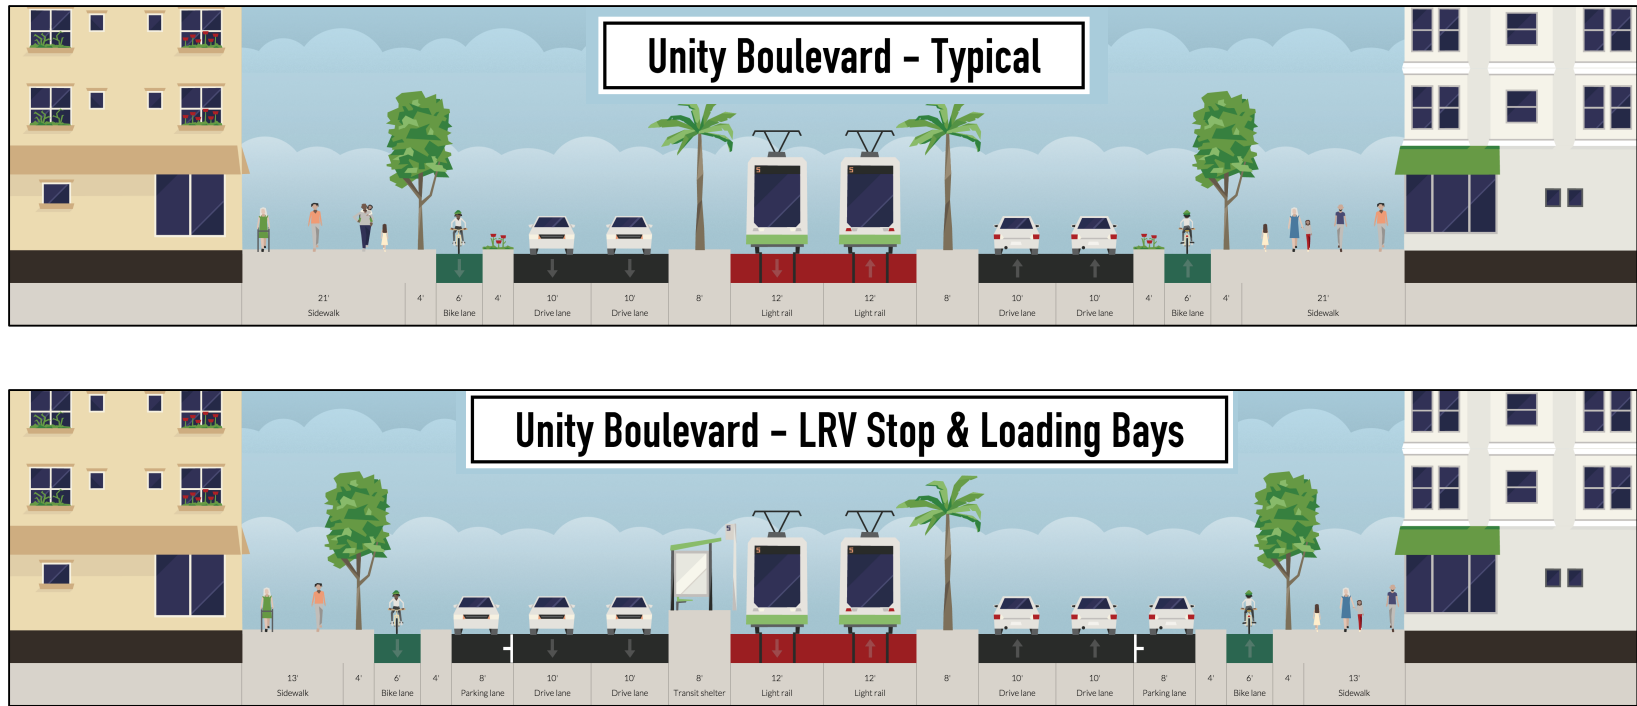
Unity Boulevard cross section. There would be two lanes of auto traffic and one dedicated LRV lane in each direction, in addition to a median promenade and bike path. On-street loading would be accommodated with loading bays.
